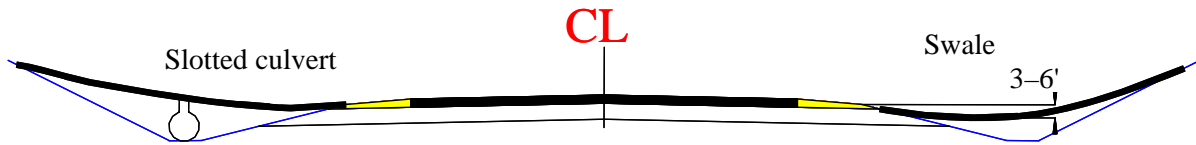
Use of swale or intercepting drain to provide positive drainage
